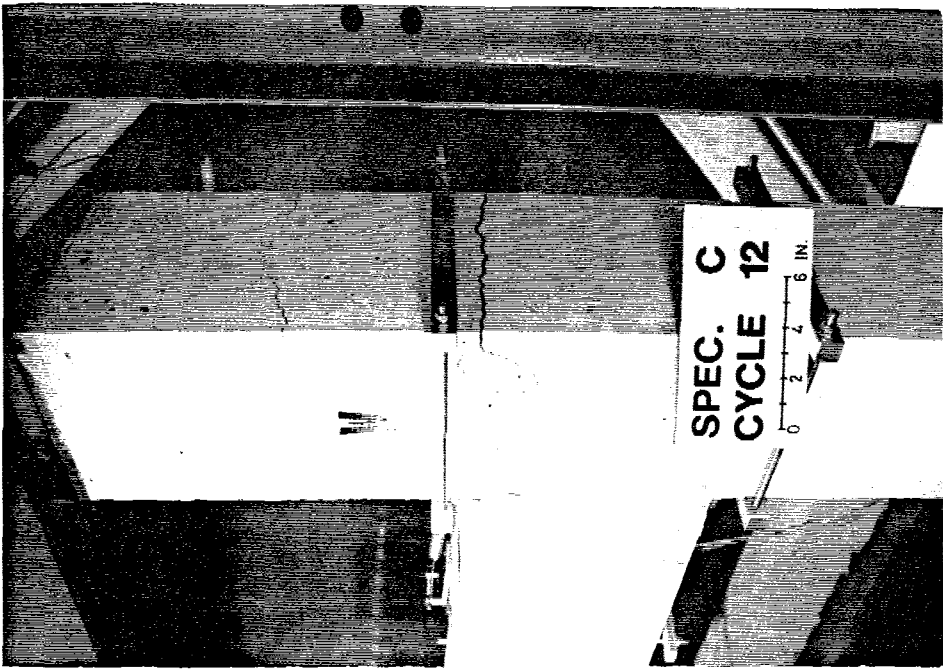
(a) Flexural Cracks in Exterior Column of Specimen C
